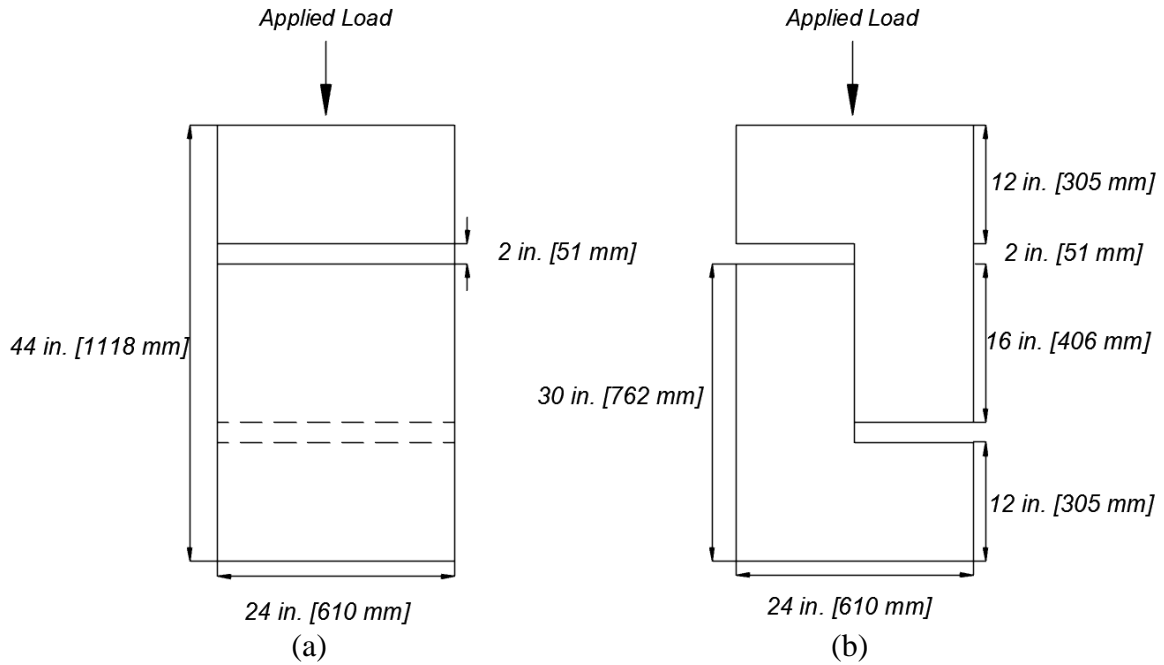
Test elevations for the specimens containing #4 (#13M) reinforcing bars across the interface: (a) Front view elevation, (b) side view elevation
